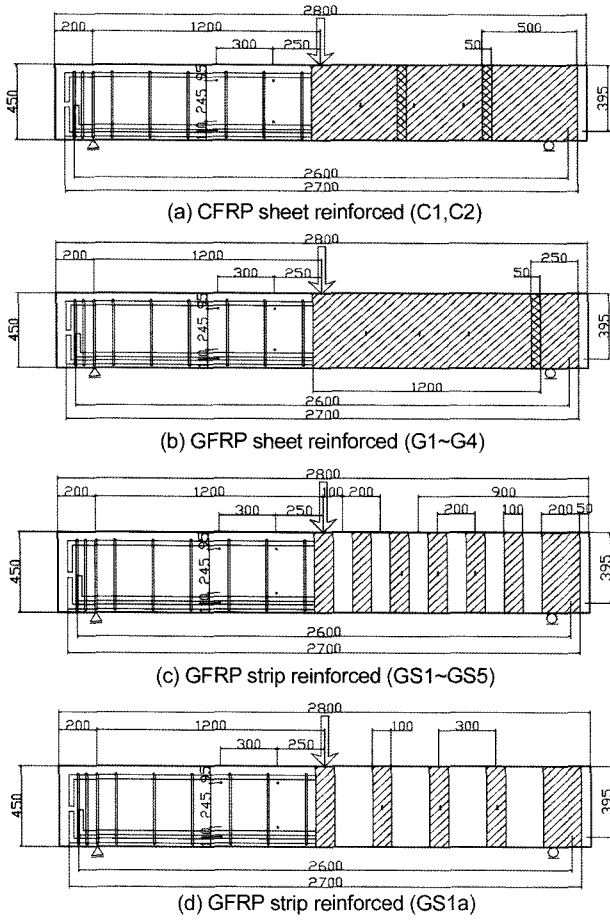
Dimensions and reinforcement of test beams (unit: mm)
